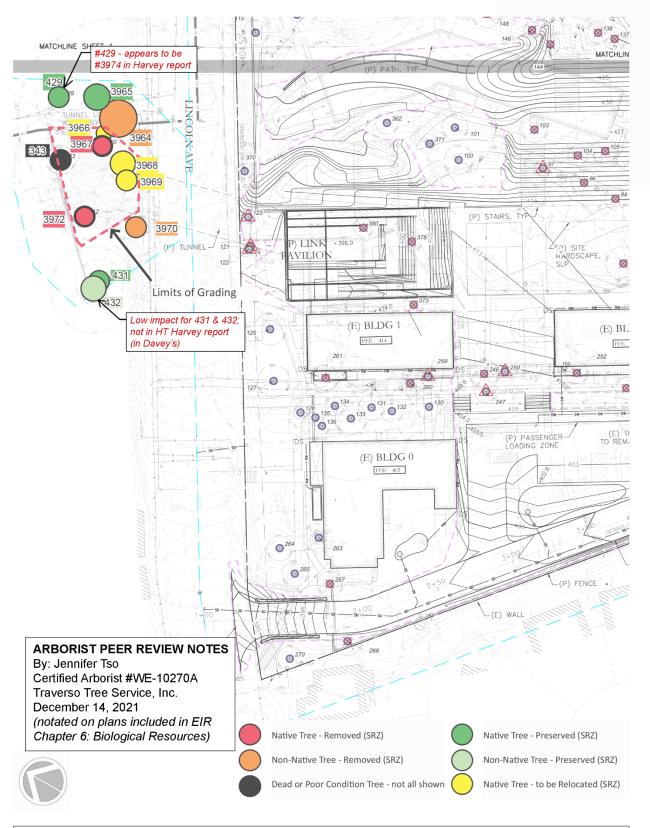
Disposition of Protected Trees, Existing Campus Tunnel Opening
